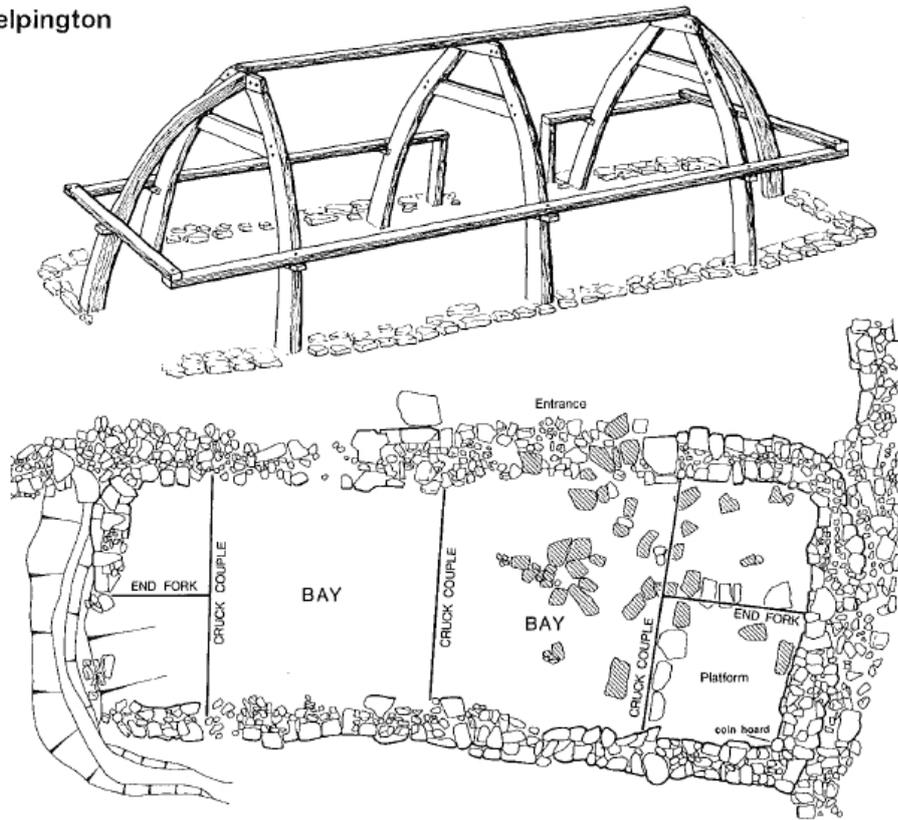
Excavated plan and suggested frame of a West Whelpington house.
